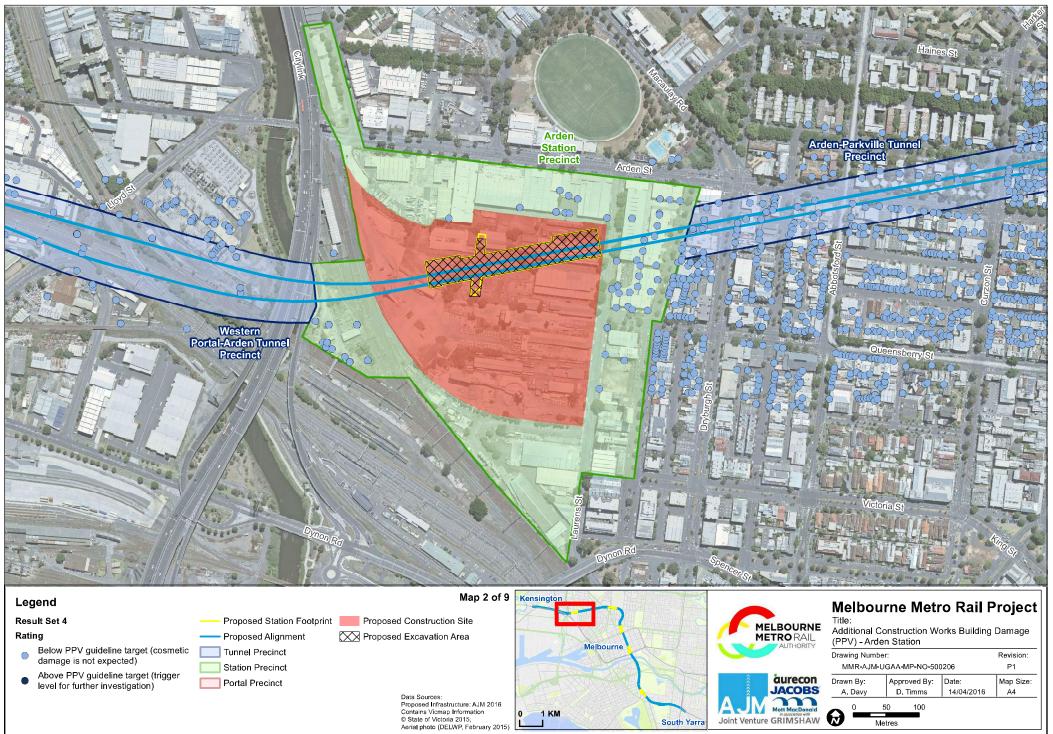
Colour coded building damage assessment due to Additional Construction Works – Arden Station Precinct
